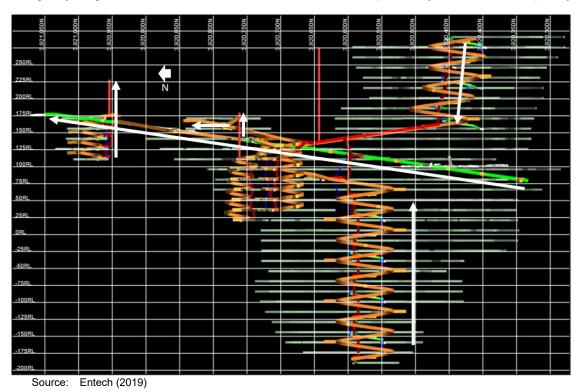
Lateral and vertical development layout showing the escapeway network. White arrows show routes to escape for different areas of the mine.
